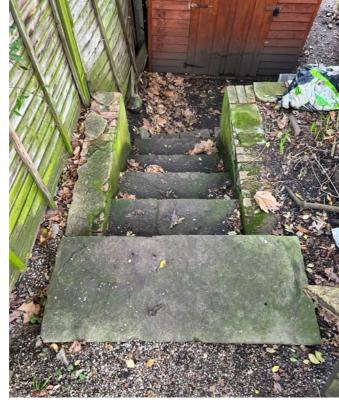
| View of existing stone steps down to lower end of garden where existing shed is located
